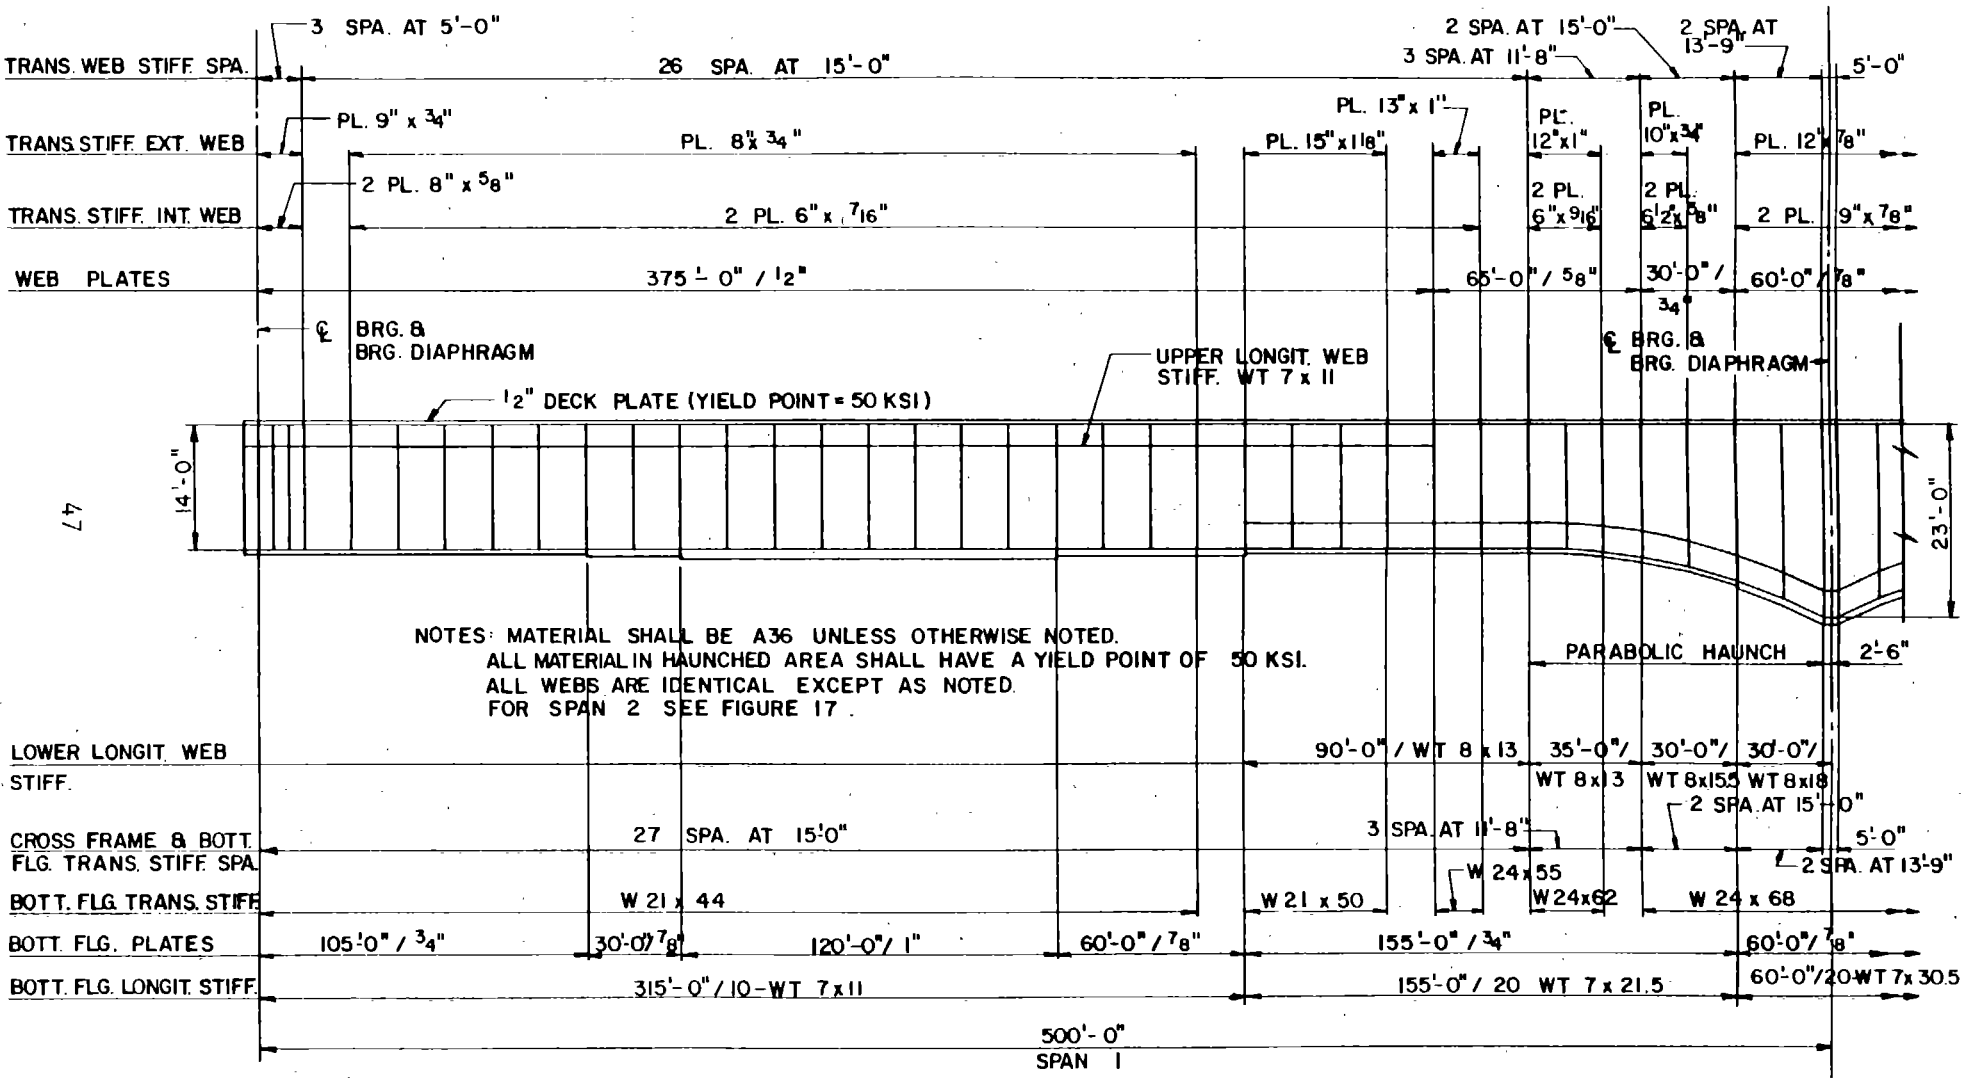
INTERIOR ELEVATION OF GIRDER WEB - AASHTO DESIGN - LONG SPAN
